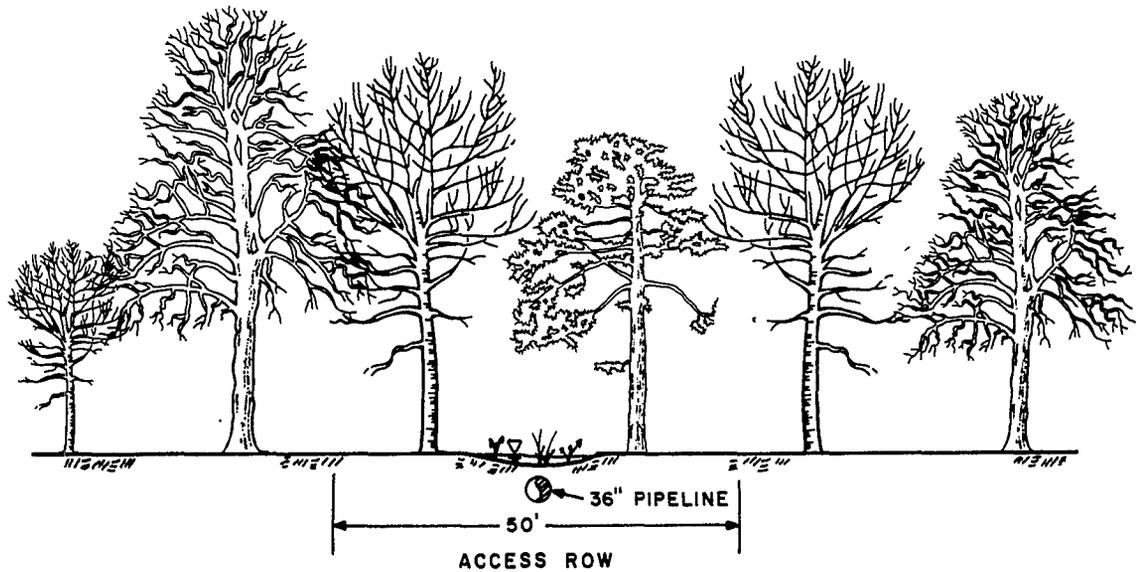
Typical Cross-Section of Conventional Push Ditch Pipeline Construction After Excavation and Several Years After Backfilling.
